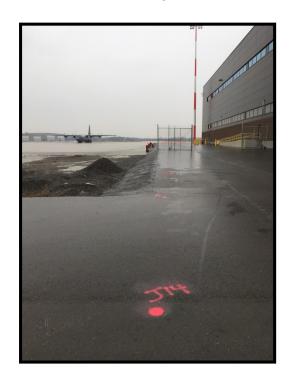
View from southeast corner of concrete pad (to be removed) of former Hangar 6 looking north towards airfield (apron)
